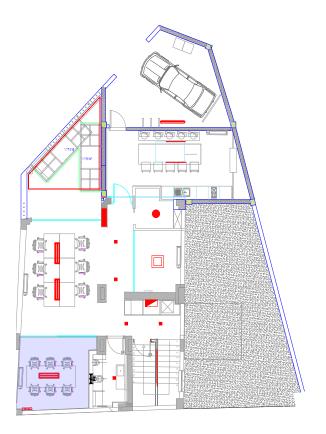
ERKE's Lighting Meeting Room Layout in Basement
